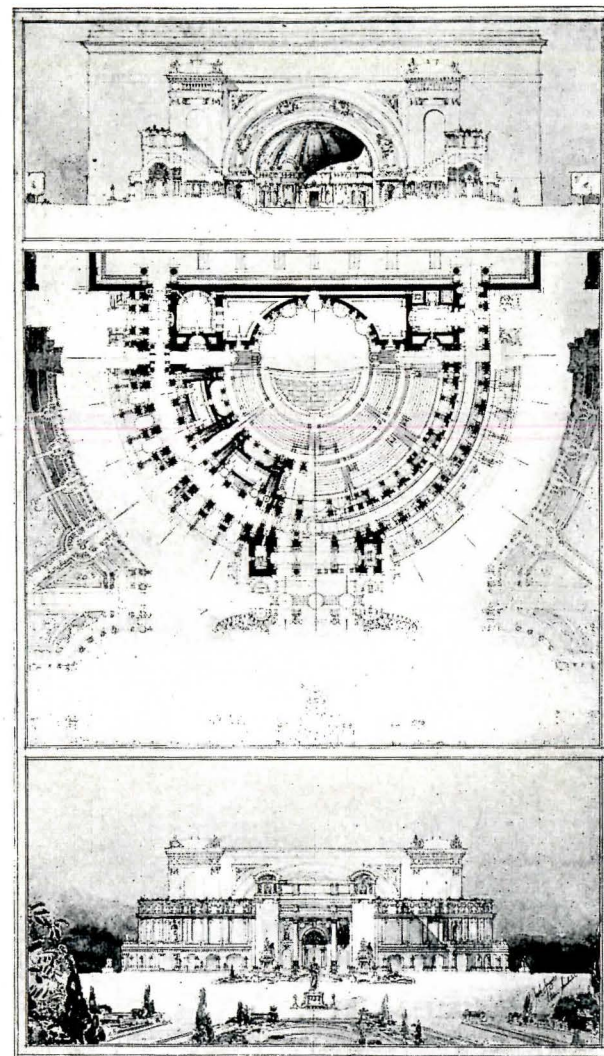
Class B. Plan Problem. "An Open Air Theatre." Jack Sanger, Atelier Hornbostel.
